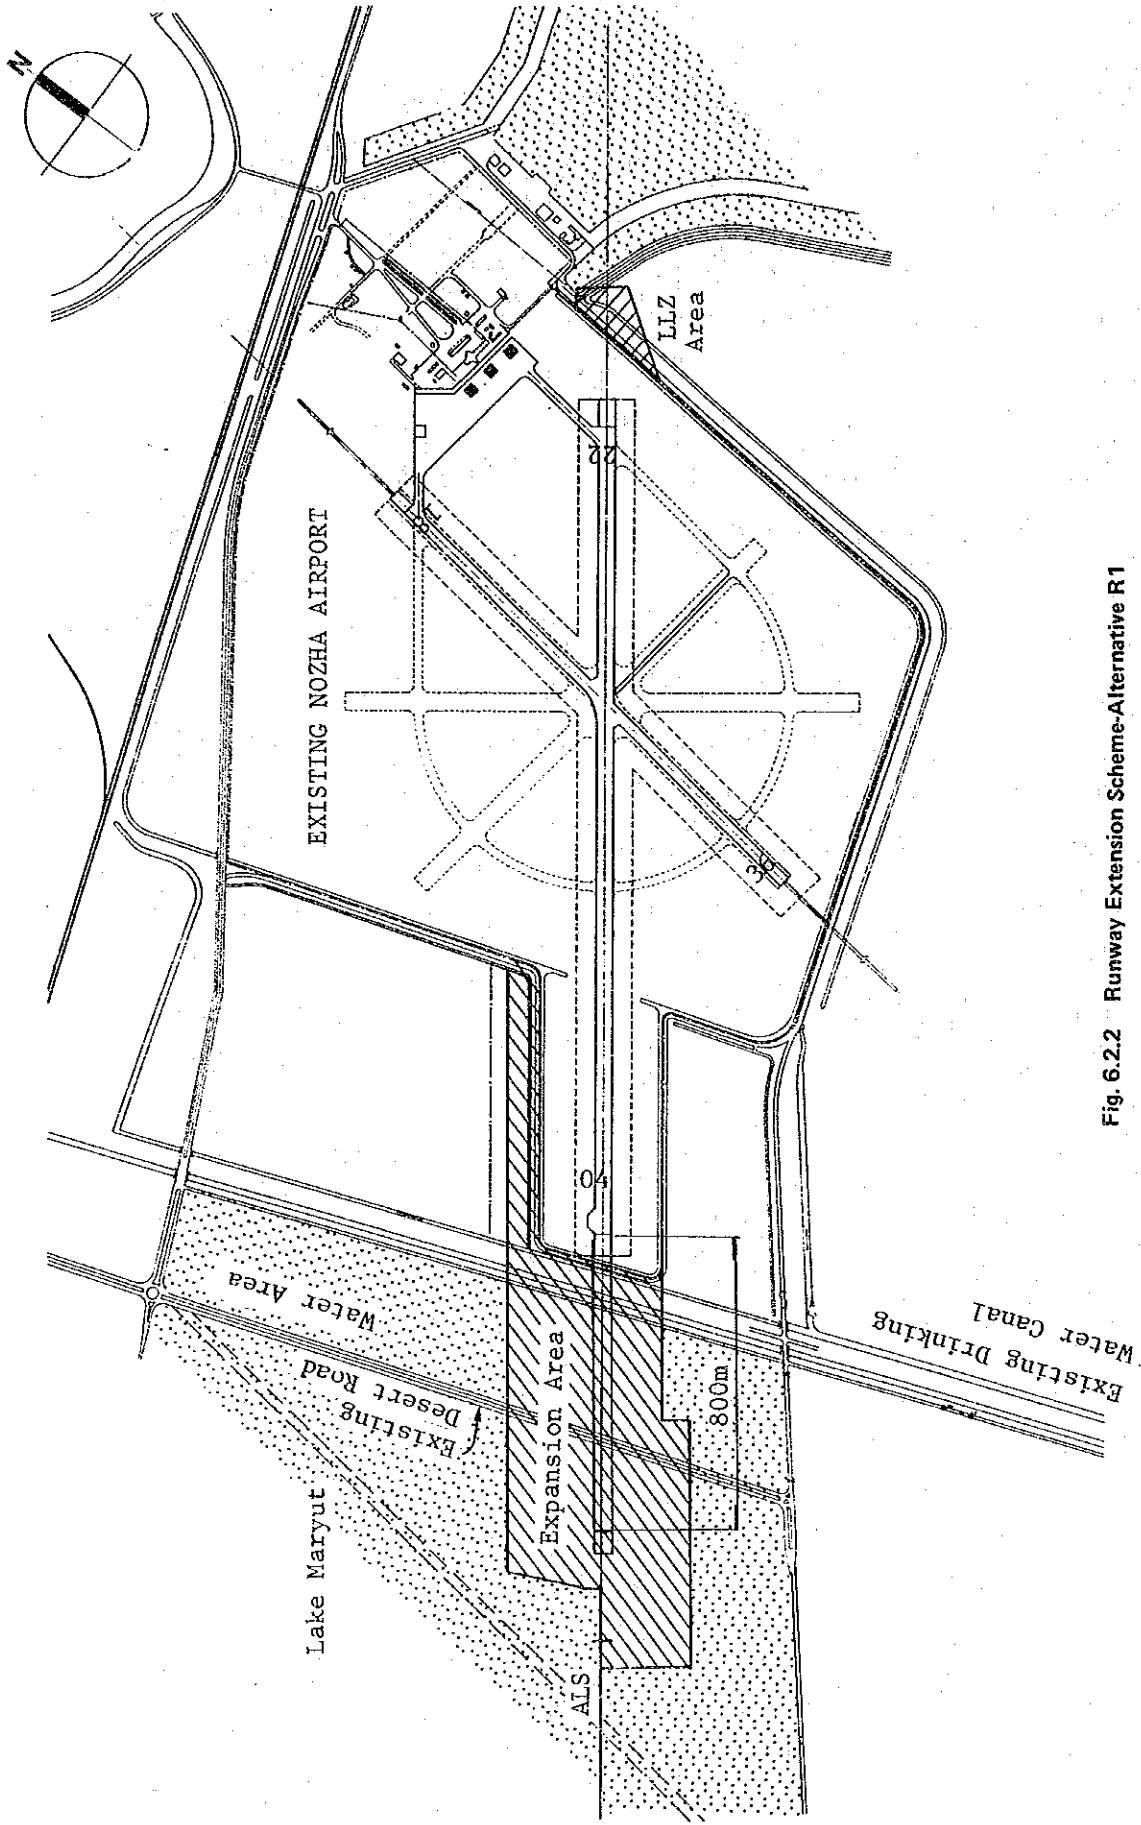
Runway Extension Scheme-Alternative R1
